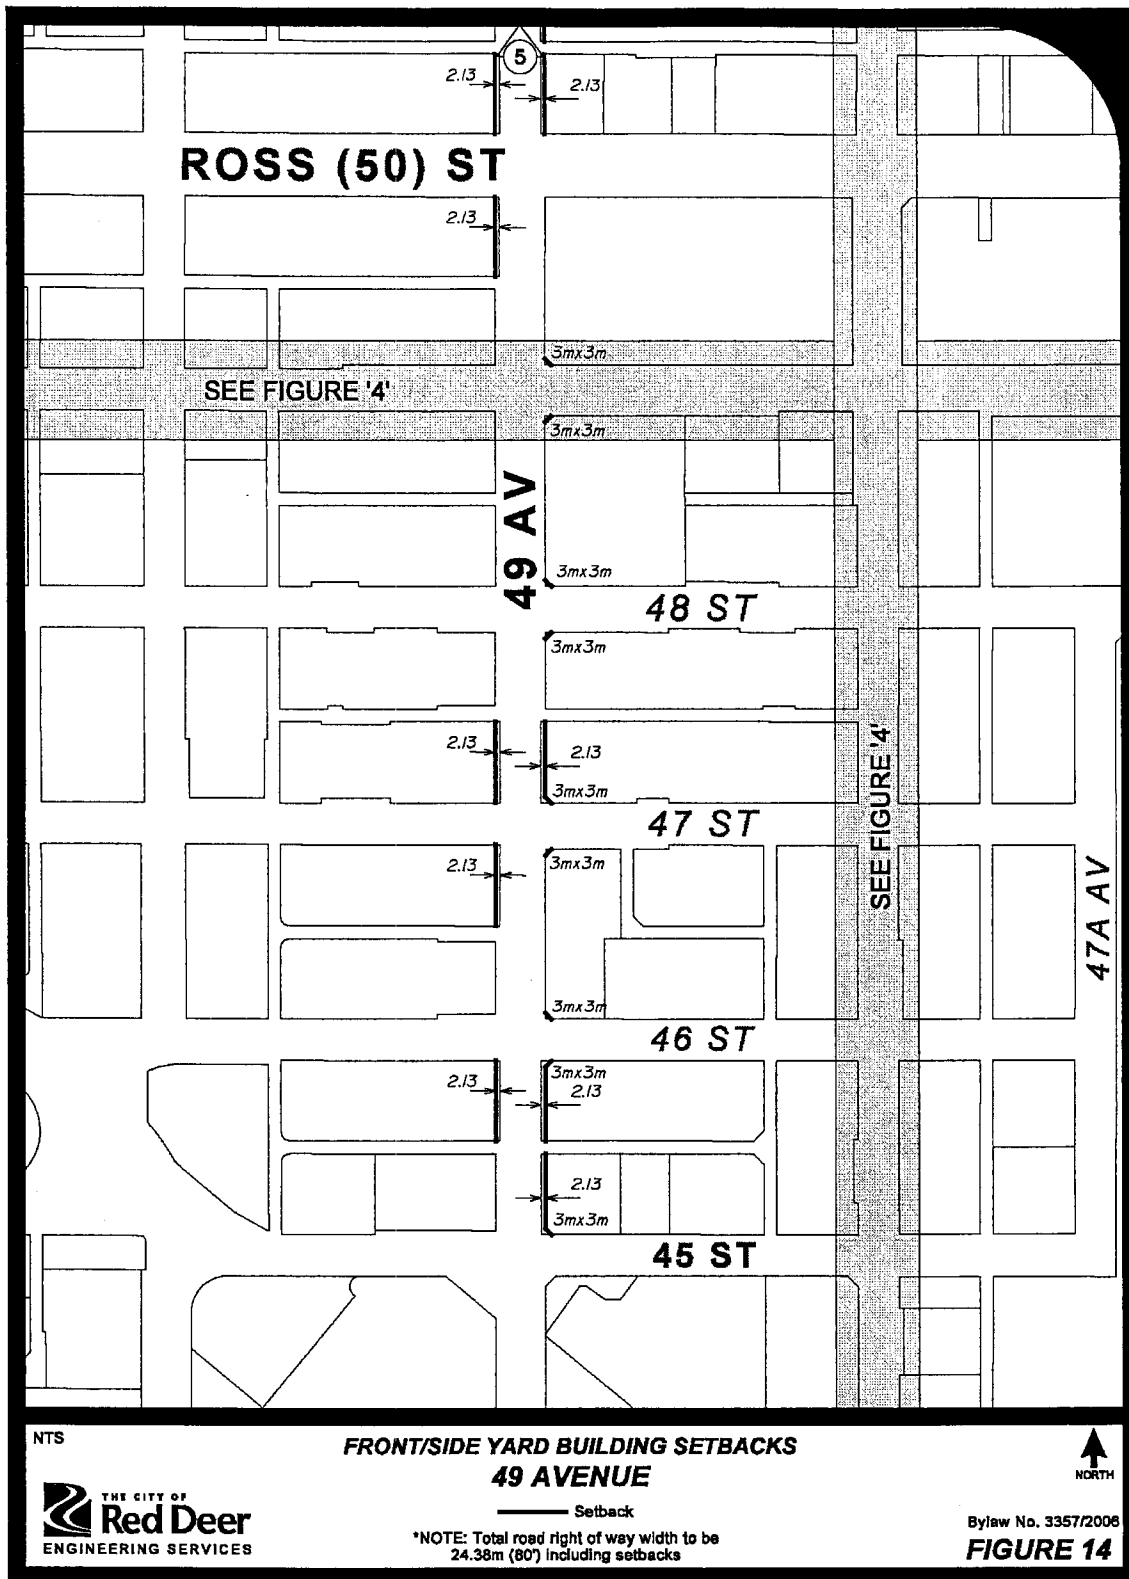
Front/Side Yard Building Setbacks 49 Avenue
